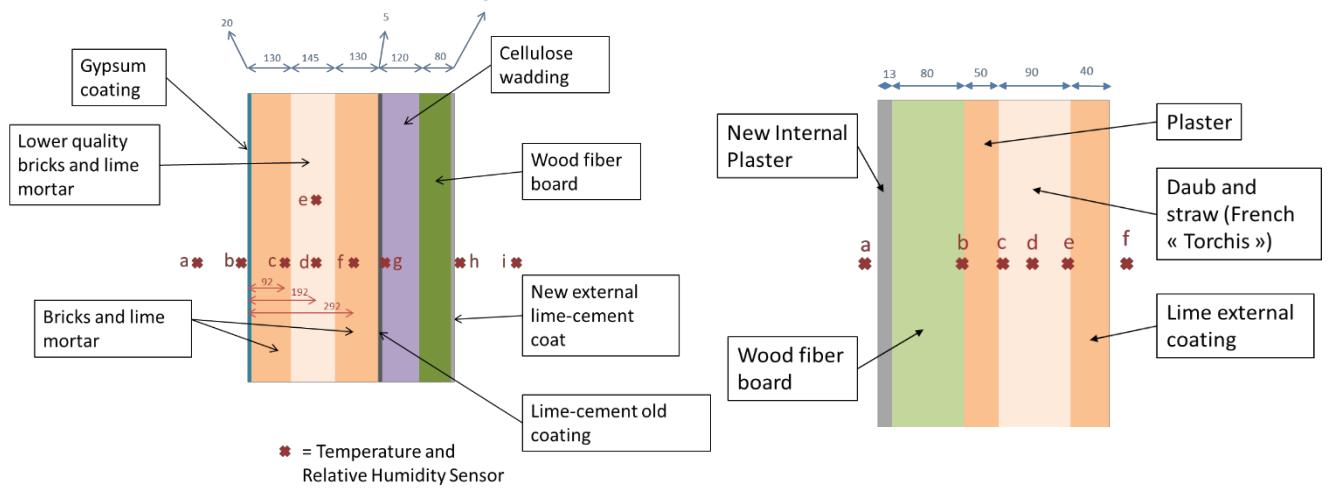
Monitoring and configuration of the wall east of the house A (left) and the wall south of the house C (right). (dimensions in mm)
